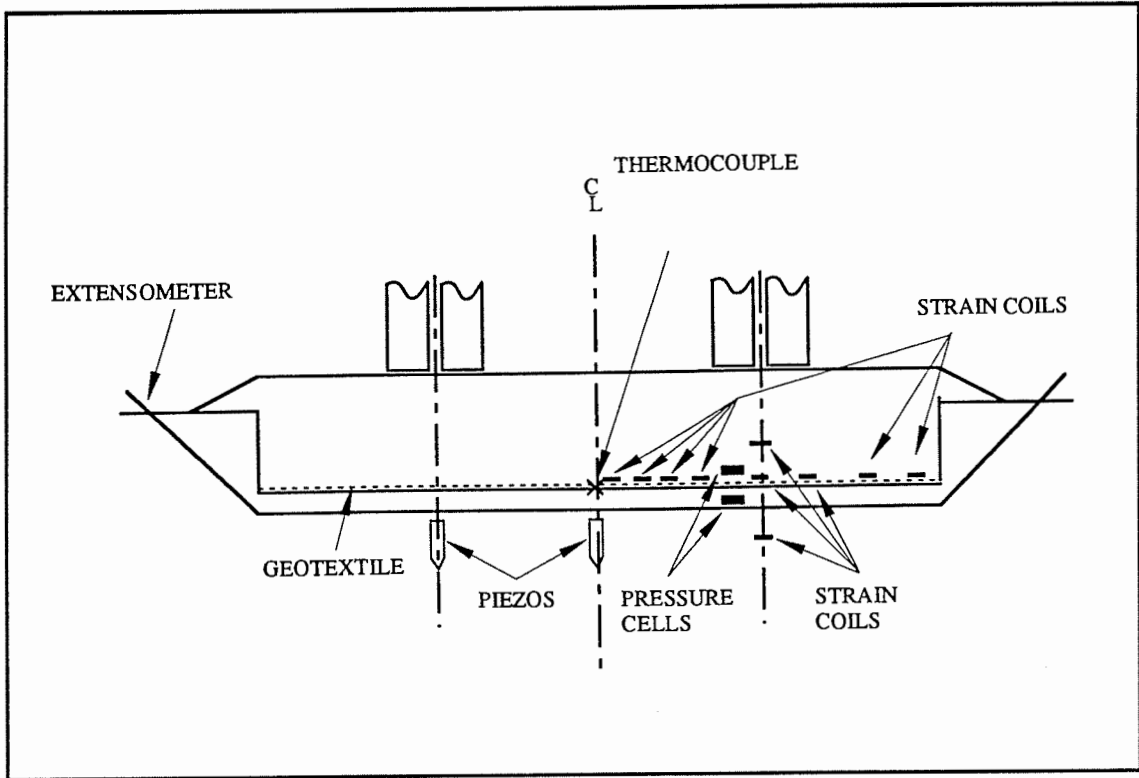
Instrumentation Layout - Lower-bound Pavements
